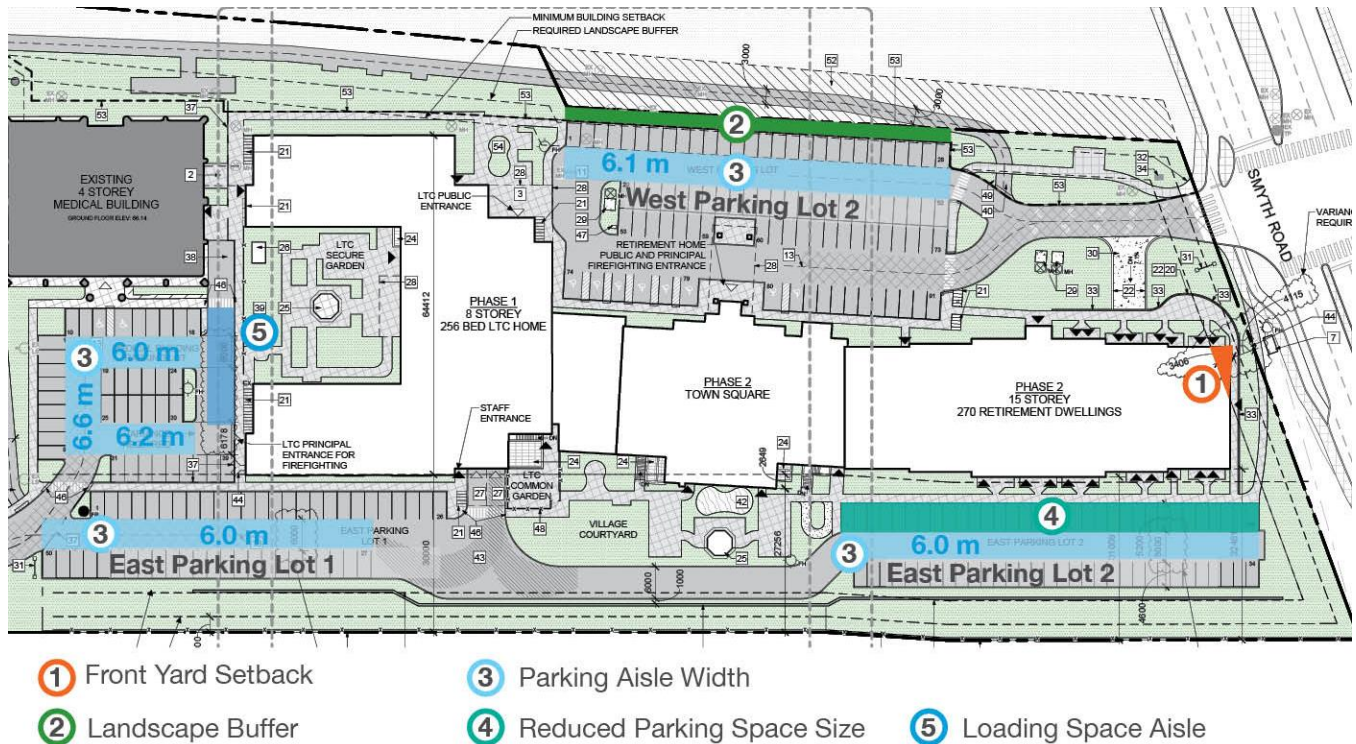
Extract from Site Plan with Minor Variances Highlighted
